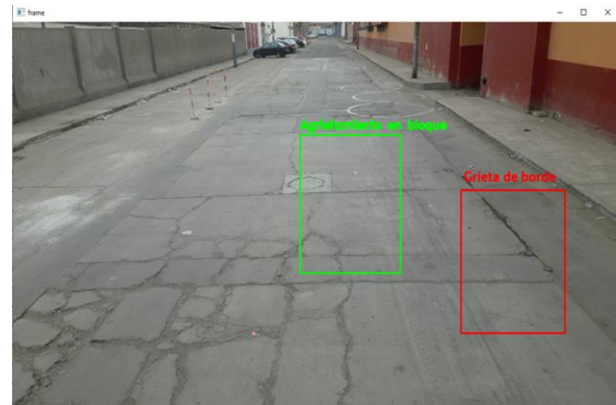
Block Edge Cracking and Cracking Failure Detection via Drone Camera
